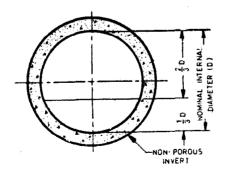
Typical Cross-Section of Concrete Porous Pipe with Non-porous Invert
